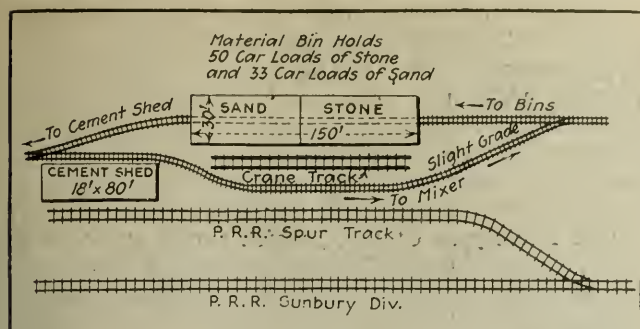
LAYOUT OF MATERIALS PLANT WHERE INDUSTRIAL RAILWAY IS USED
